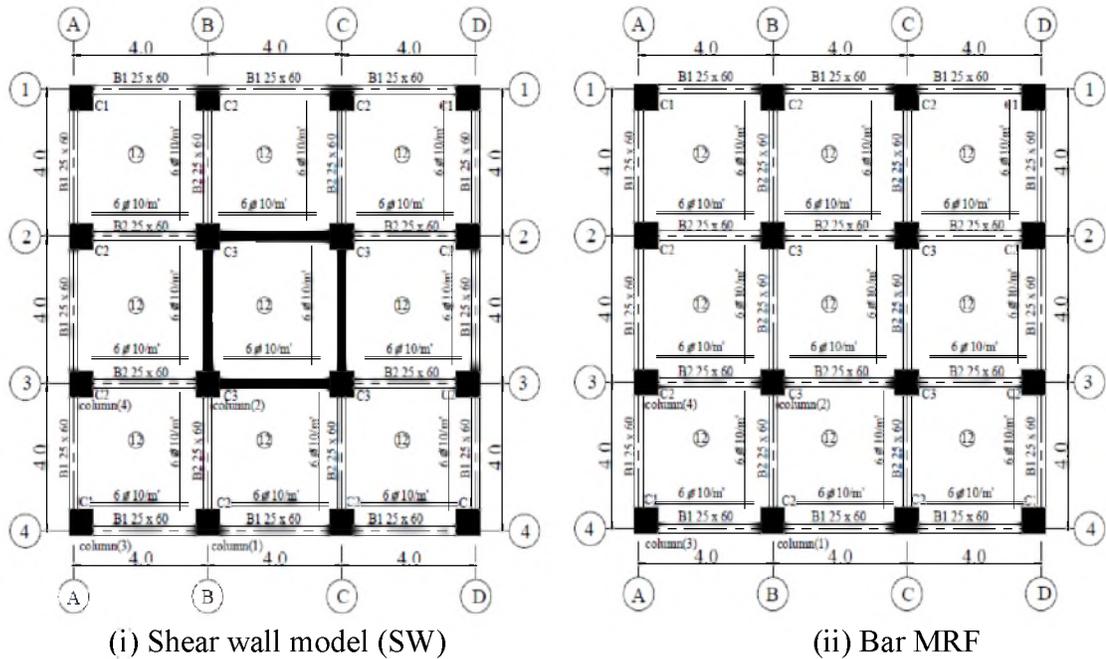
Typical structural plan of each floor of the 20th story building model (Farghaly, 2012)
